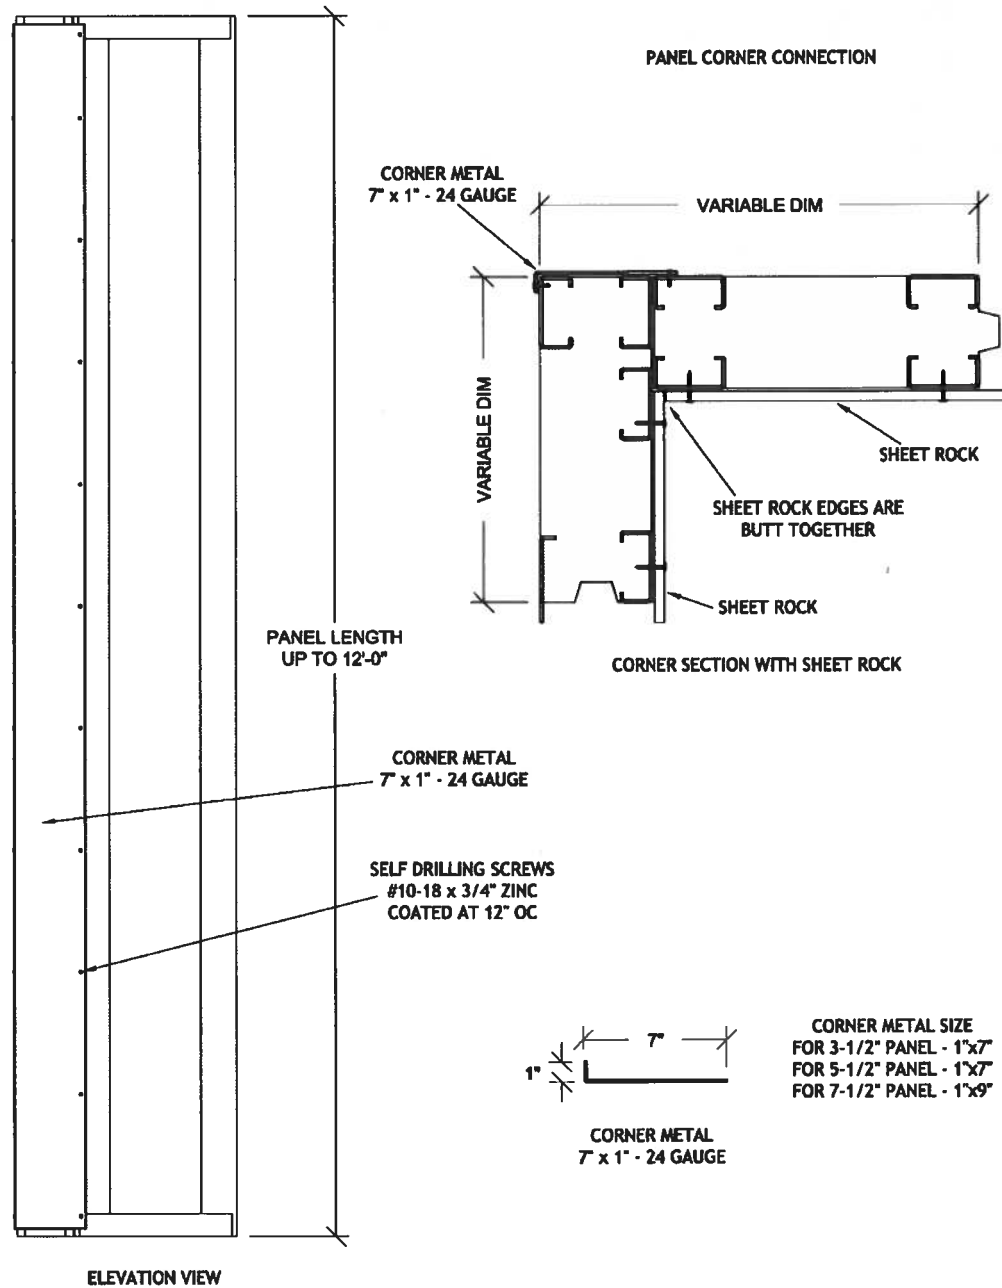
T-G Wall Corner Detail and Gypsum Installation
